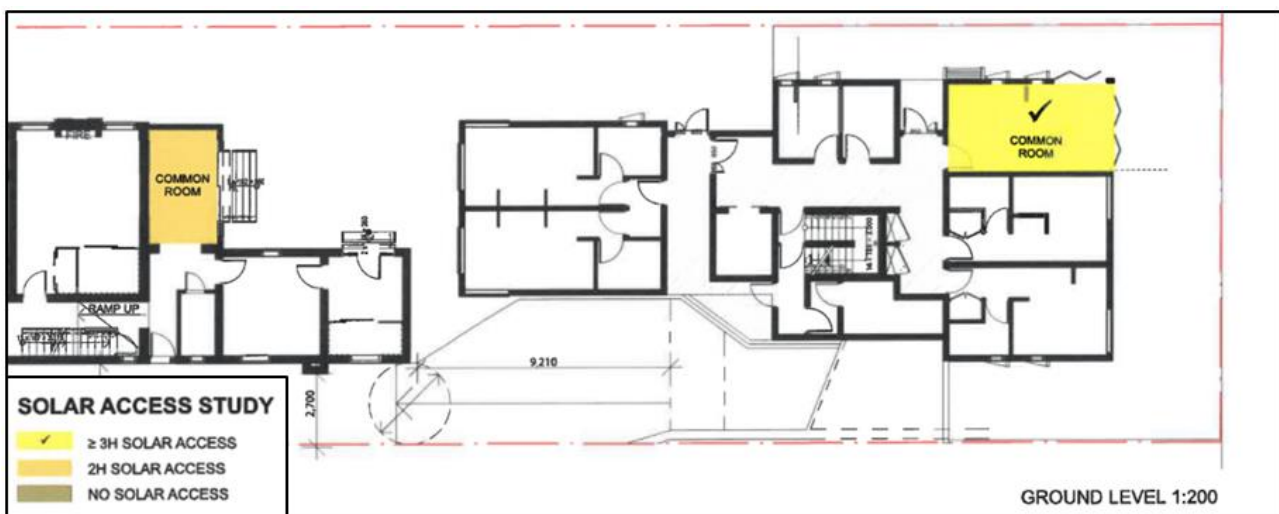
Excerpt from court approved plans demonstrating solar access to common rooms.
